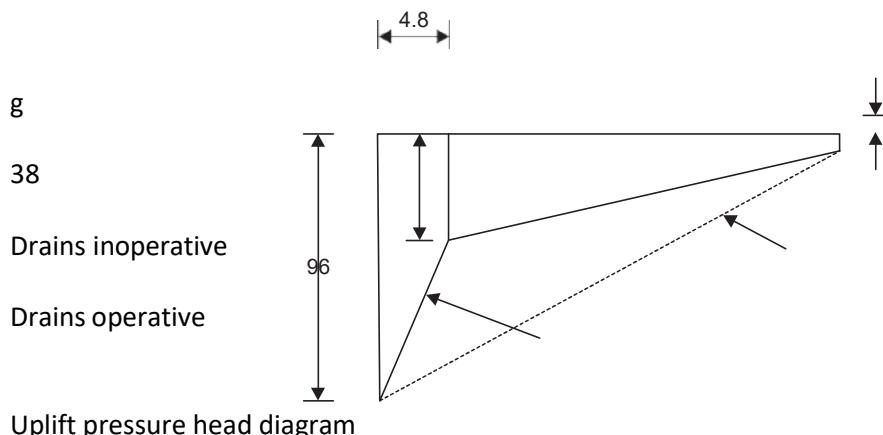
Profile and uplift pressure diagram for the gravity dam of Example 16.1
